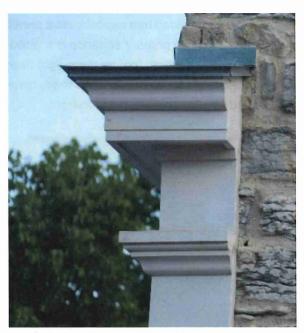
Detail of molding profile of friezeboard and corner pilaster.
